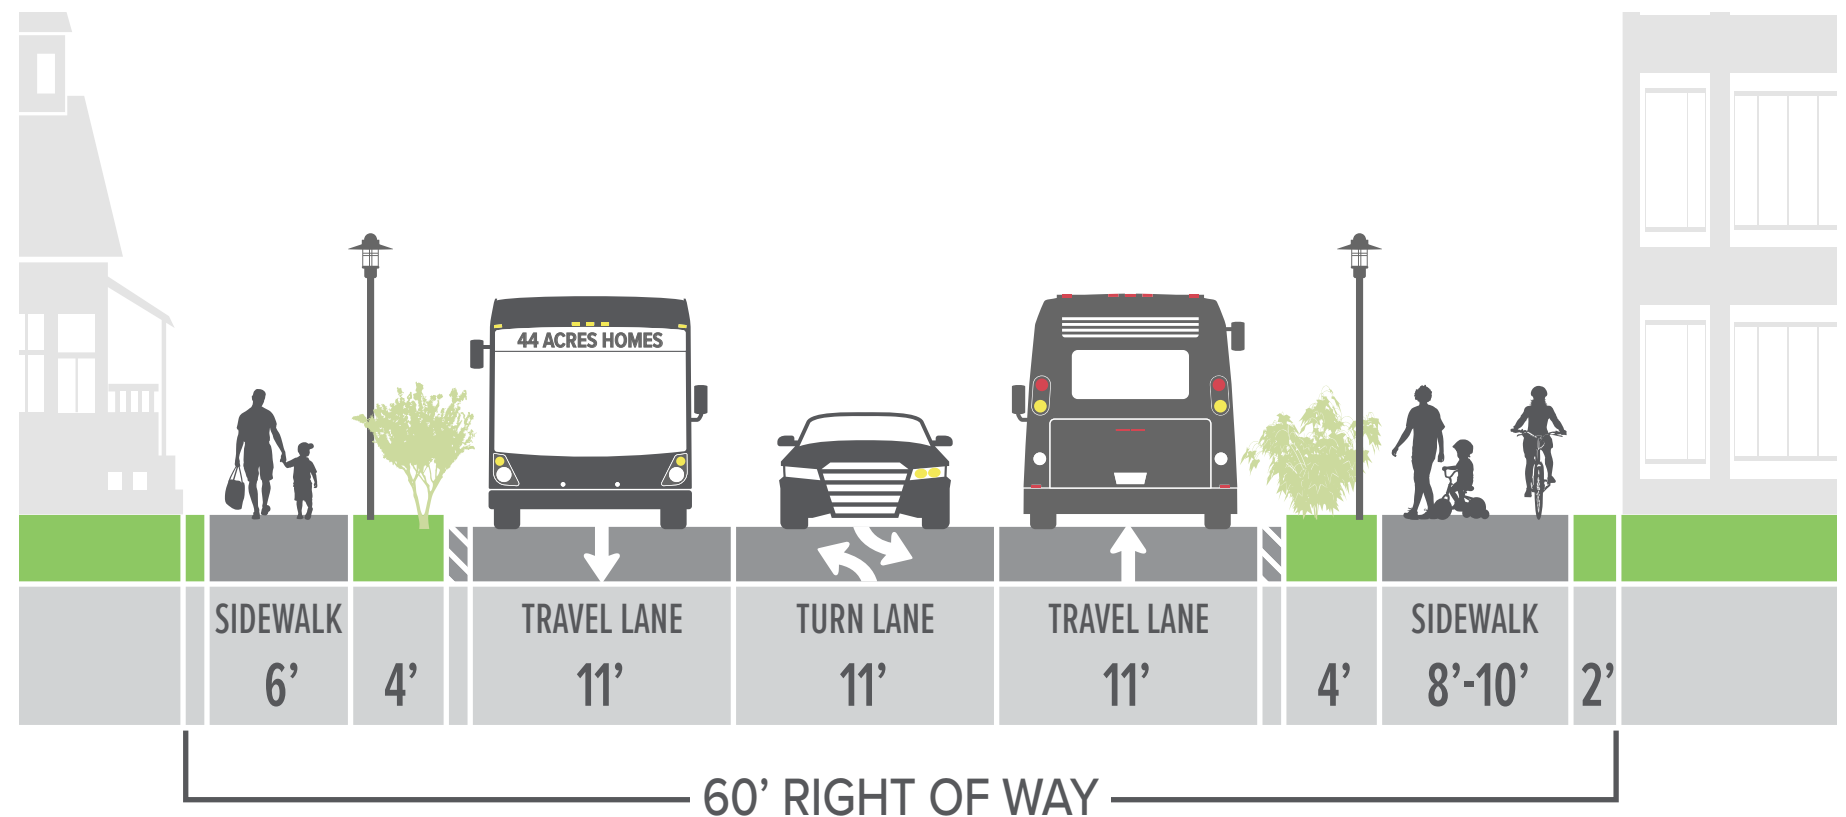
N Main Street Reconstruction Project Example Recommended Cross Section (Source: Team Analysis, 2026)
